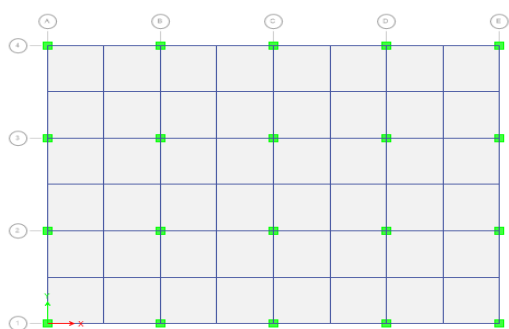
Plan Layout of Twenty Storeys Rectangular Shape Building with Brick Infill Walls
